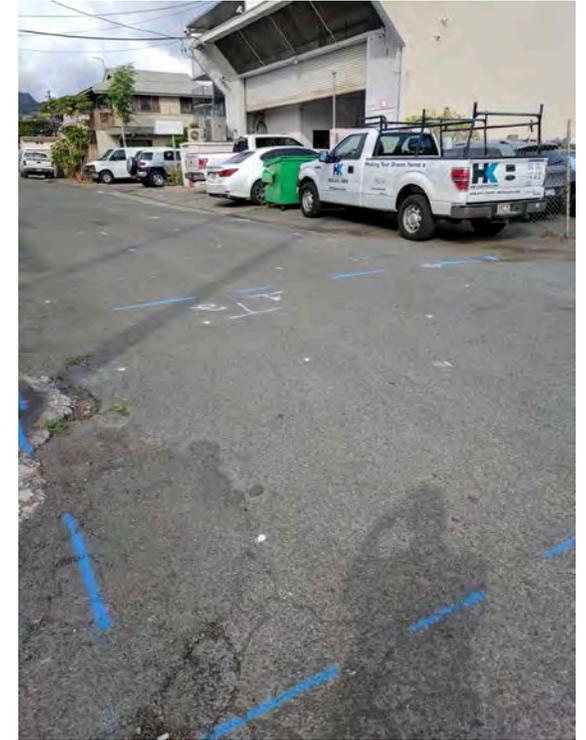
Factory Street viewed towards east/northeast. Water lines (blue) are marked on the Ewa side (left) and crossing Factory Street right before the intersection with Waterhouse Street.
